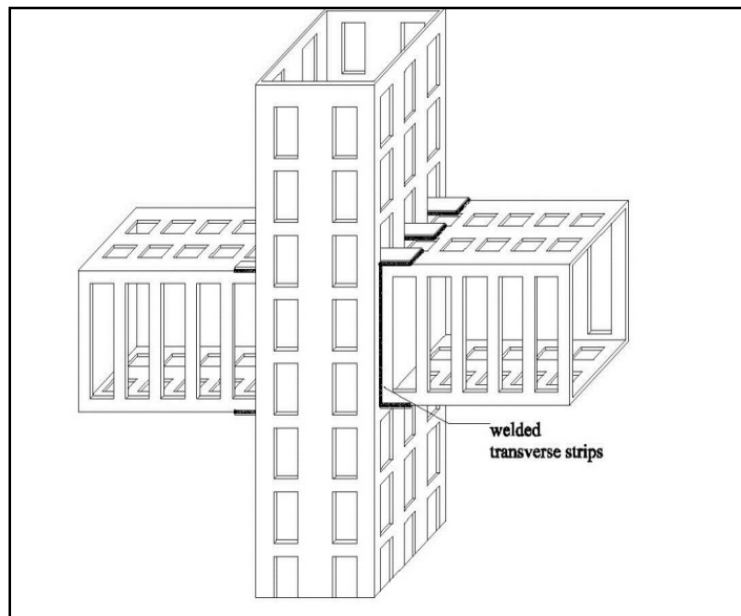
Welding the edges of the beam PCS to column reinforcement
